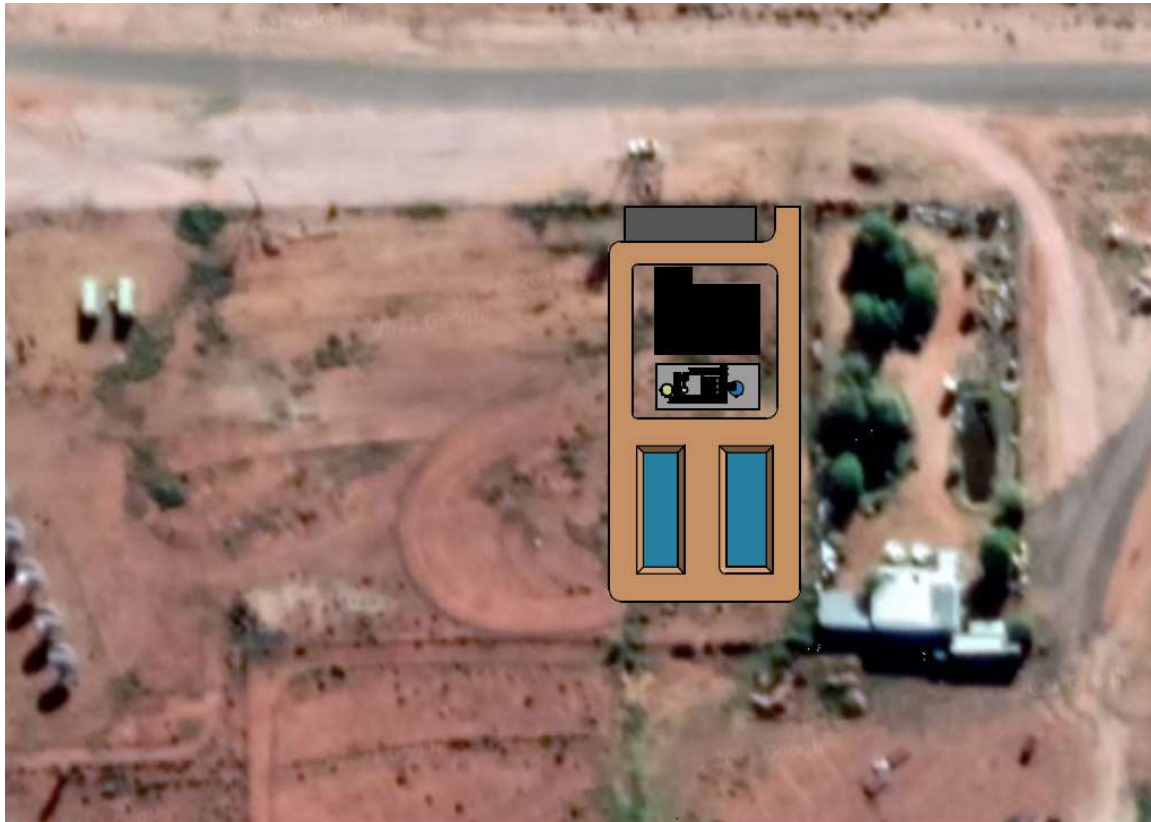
Proposed new White Cliffs WTP Site Layout
